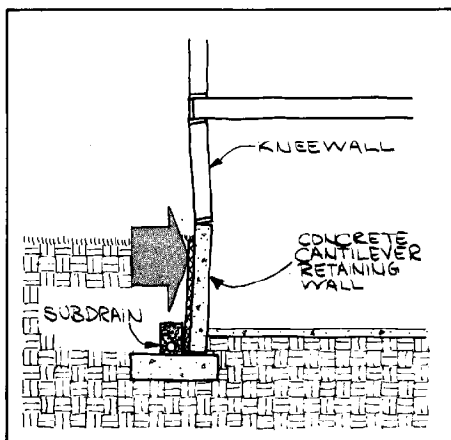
Some designs call for a wood kneewall up the side of a stepped foundation. With this detail, however, the foundation wall can be pushed in and crack near the footing.
